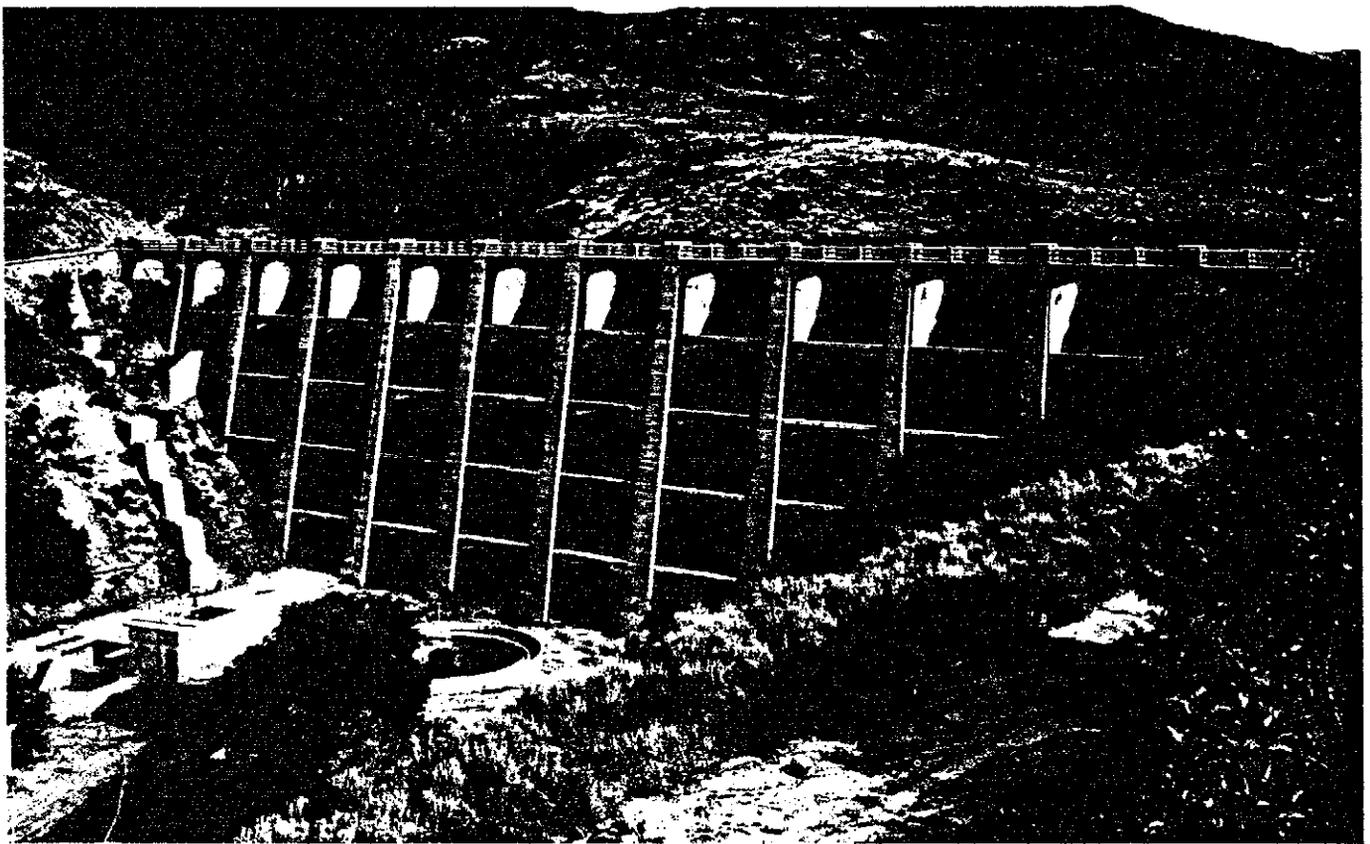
Downstream face of Mountain Dell Dam. Covered spillway is on left and water treatment facilities are in foreground. 1973. (Courtesy of Jack E. Boucher)
